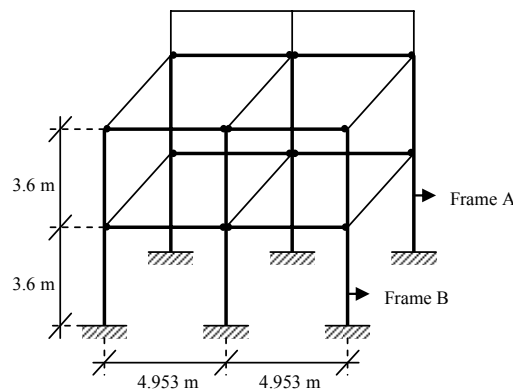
General layout of the “UK” building tested at BRE laboratory
